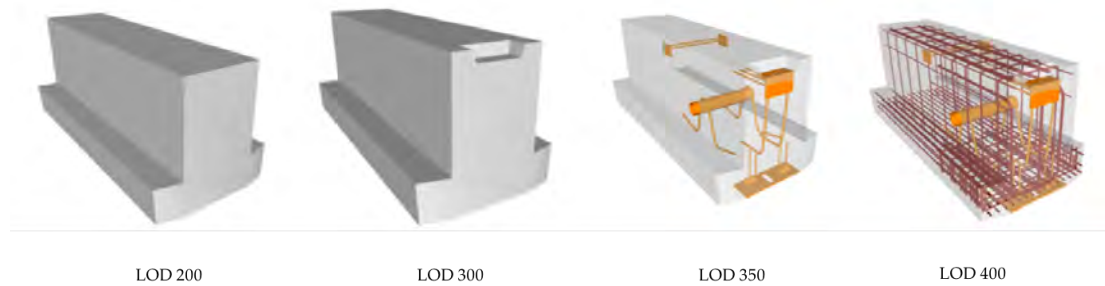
A precast structural inverted T-beam (concrete) model from LOD 200 to LOD 400 (Forum 2017).
